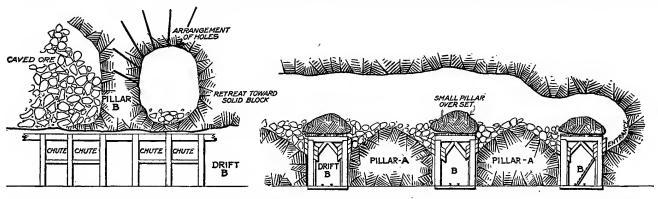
LONGITUDINAL AND END SECTIONS SHOWING METHOD OF OPENING UP AND STOPING UPPER SUB-LEVEL AT FORTUNA MINE
